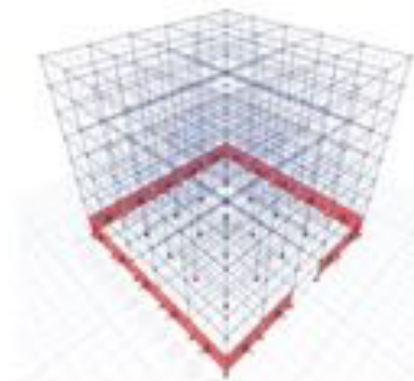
D Elevation of 8 Storey Building (Model 1A)
